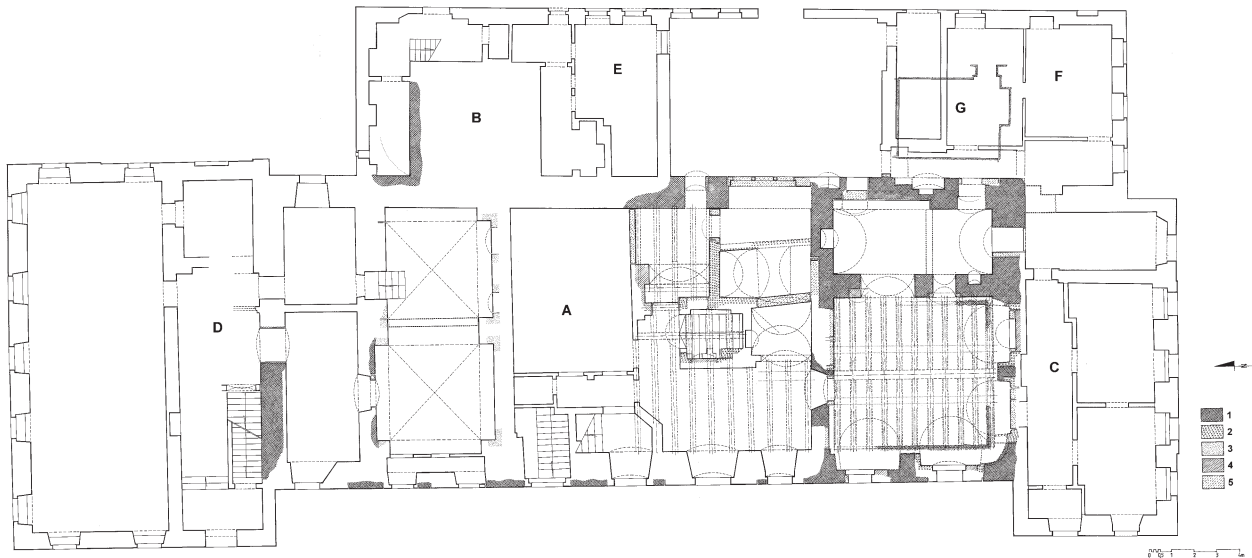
Plan of ground floor of middle wing of the town hall and the tower with layers of the examined walls: 1) walls from the 15th century, 2) walls from the 1540s, 3) walls from the 1660s–1670s, 4) walls from 1788–179, 5) walls from the last third of the 19th–1st half of the 20th century, A) middle wing of the town hall, B) tower, C, D) side wings of the town hall, E, F) old burgher townhouses, G) location of Gothic basement of the chamber-shop in the commercial building (by J. Burnita, C. Lasota, A. Legendziewicz)
